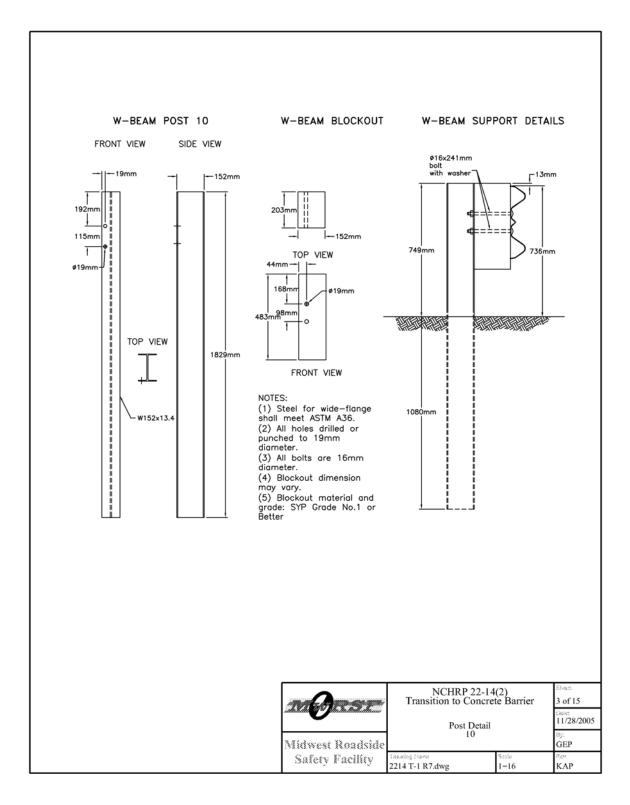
Approach Guardrail Transition to Concrete Barrier Design - Post Details
